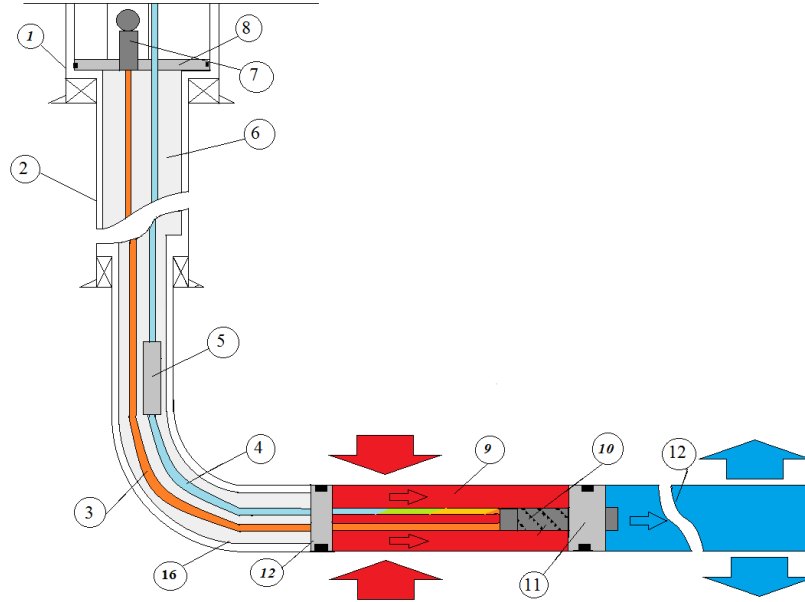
Single well design scheme. 1- surface casing; 2 – intermediate casing; 3 – hot stream; 4 – cold stream; 5 – working fluid pump; 6 – completion fluid; 7 – turbine-generator assembly; 8 – packer; 9 – hot brine from the reservoir; 10 – brine pump; 11-packer; 12 – injection side
